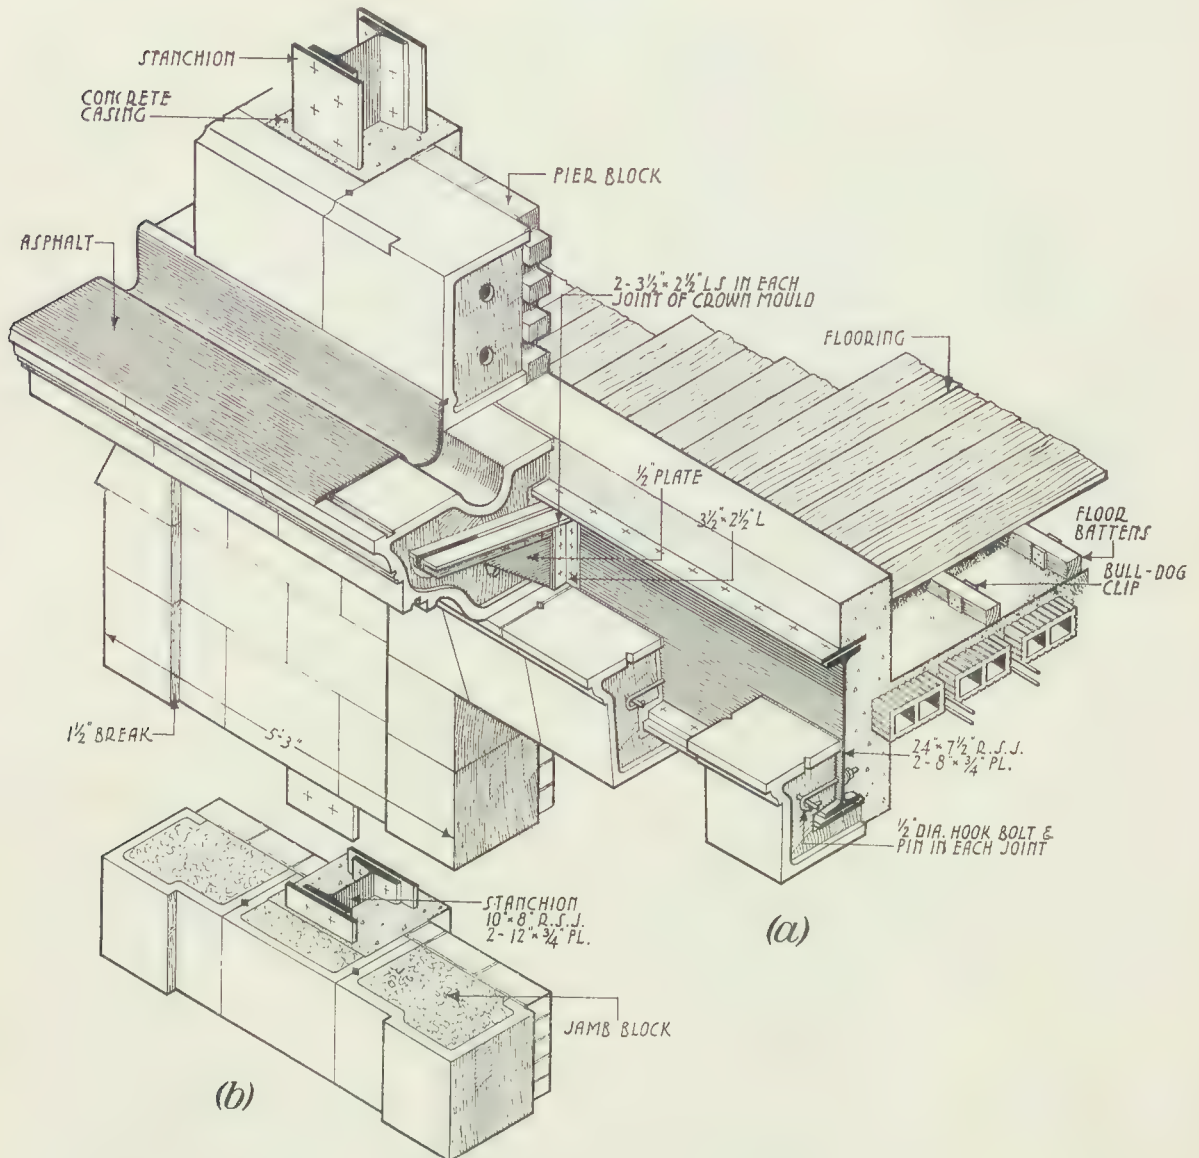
CONSTRUCTION OF TERRACOTTA CORNICE AND PIER
